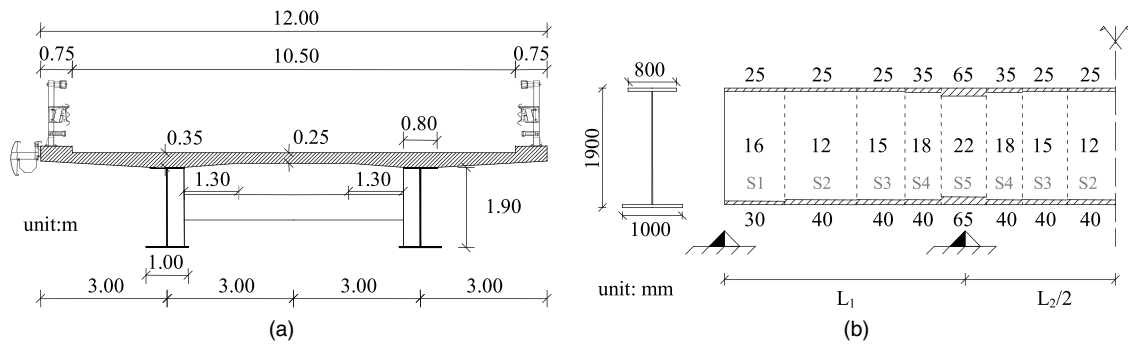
Bridge deck cross section properties: (a) typical deck transverse cross section; (b) girder cross section geometry
